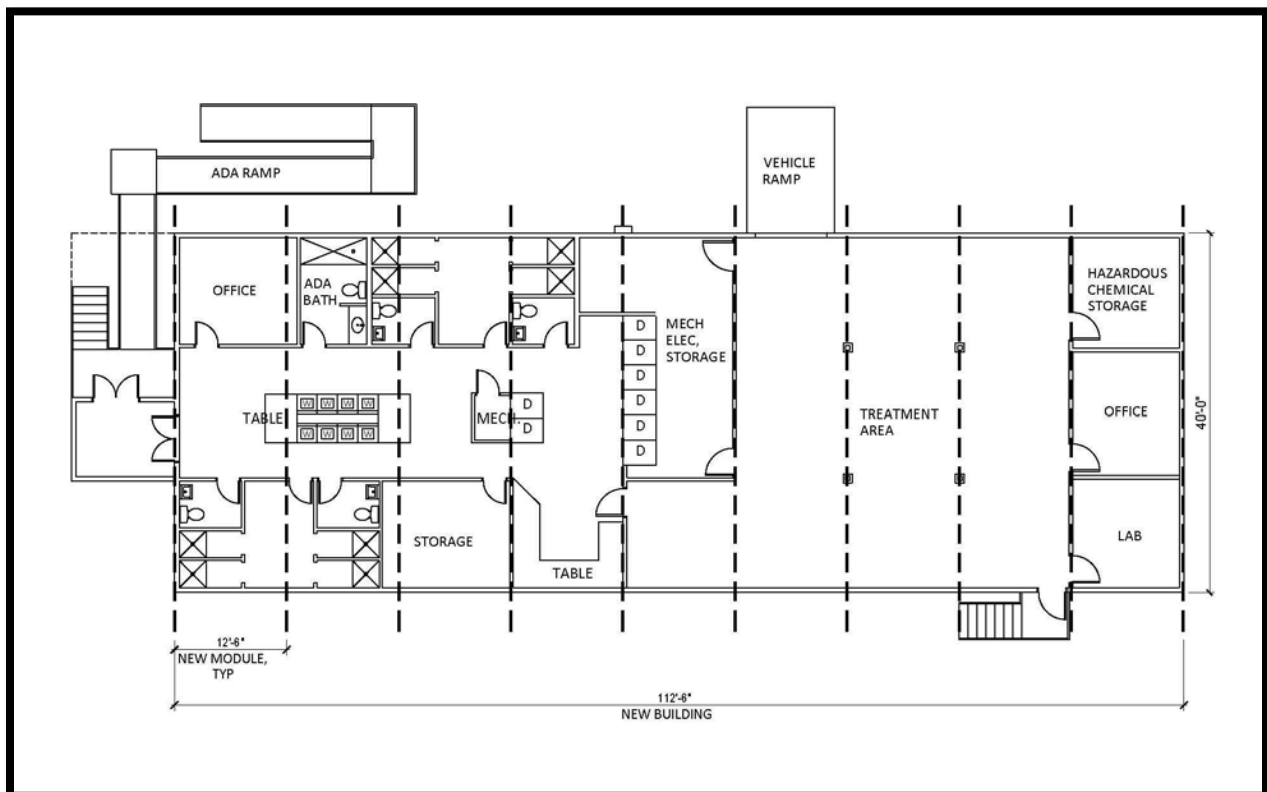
Alternative 3: New Modular WTP & Washeteria
